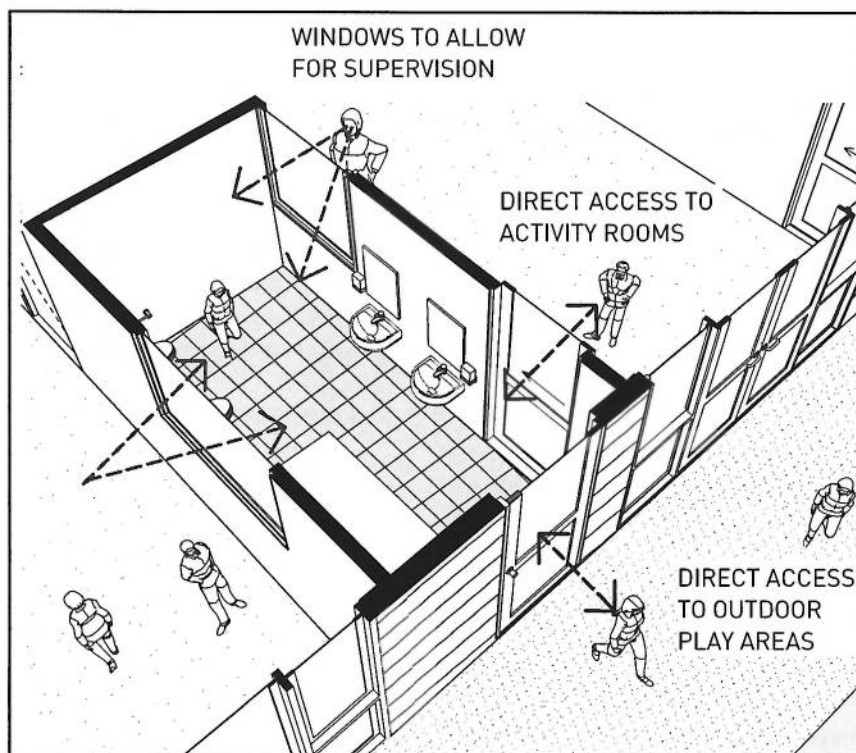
Bathroom facilities to have direct access to outdoor areas and activity rooms. Supervision requirements need to be considered in the design to prevent blind spots.
